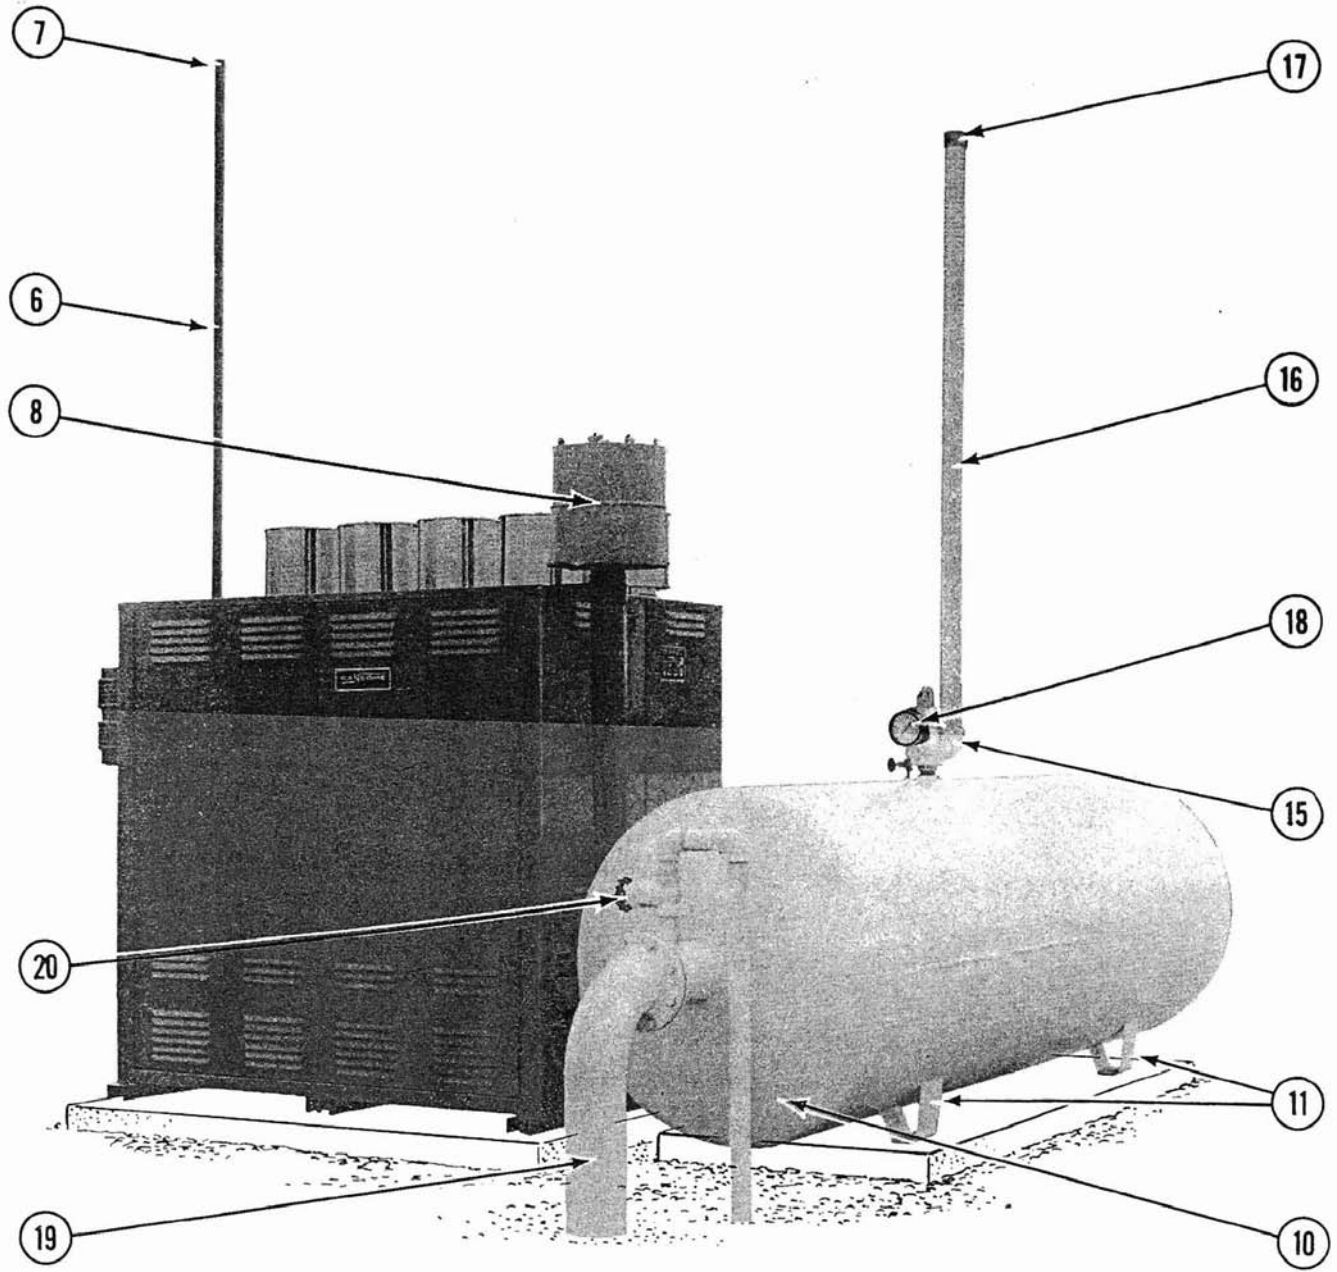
PAMW 900-50 Installation Typical for -10 to -50
